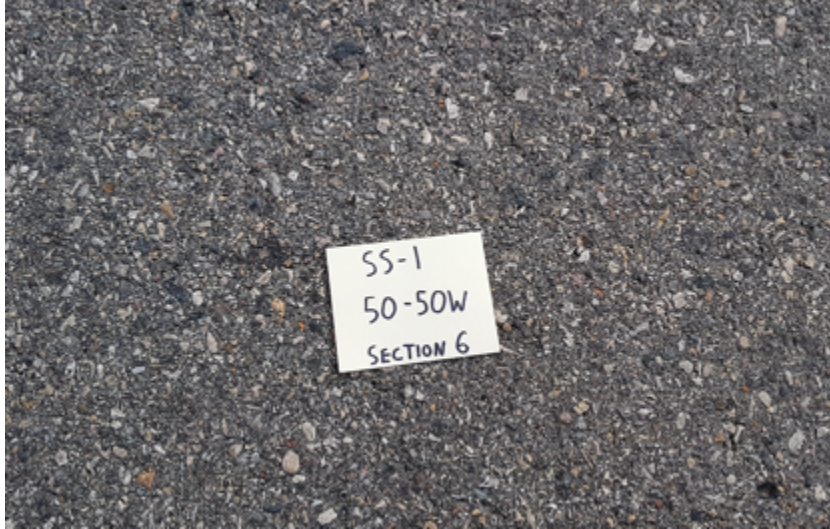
Section 6 - Full Transverse Cracks, Crack Width <5mm & Coarse Aggregate Loss <5% & Ravelling <5%
